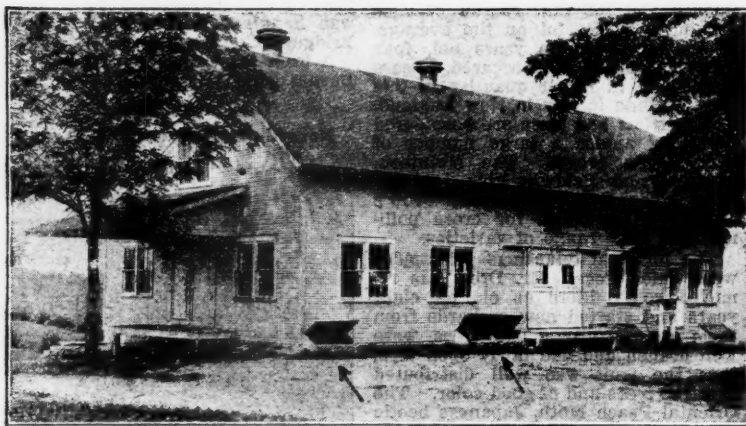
A demonstration basement apple storage and packing house built by Purdue University at Bedford, Ind. Arrows indicate openings into cool air intakes. Their construction is further shown in Figure 1. Notice also the warm air outlets at the peak of the roof
